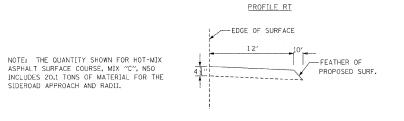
DETAIL OF INTERSECTION RT. STA. 136+38 AND LT. STA. 136+38
